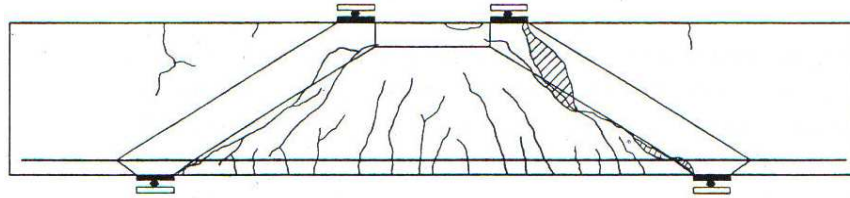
Crack propagation beam B2, experimentally tested by Ortiz in relation to the assumed diagonal and horizontal Strut. Failure occurring at diagonal Strut.
